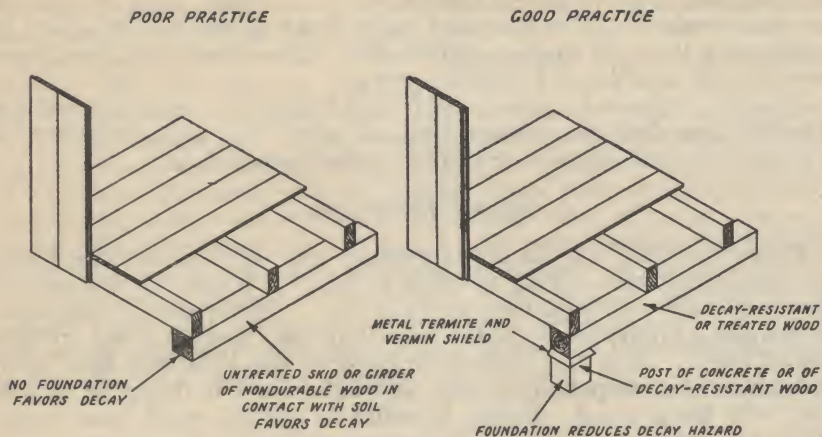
Good and poor practice for foundations of temporary buildings.
